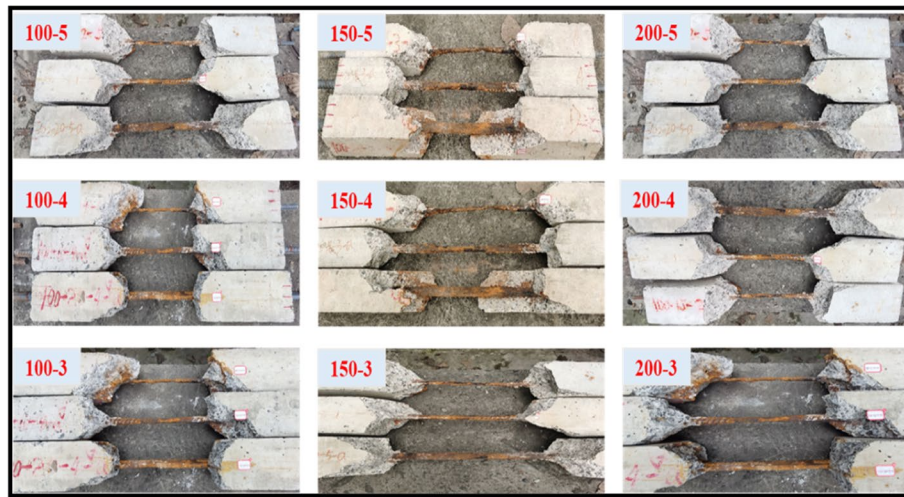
Internal situation of steel bar corrosion of concrete structure specimen
